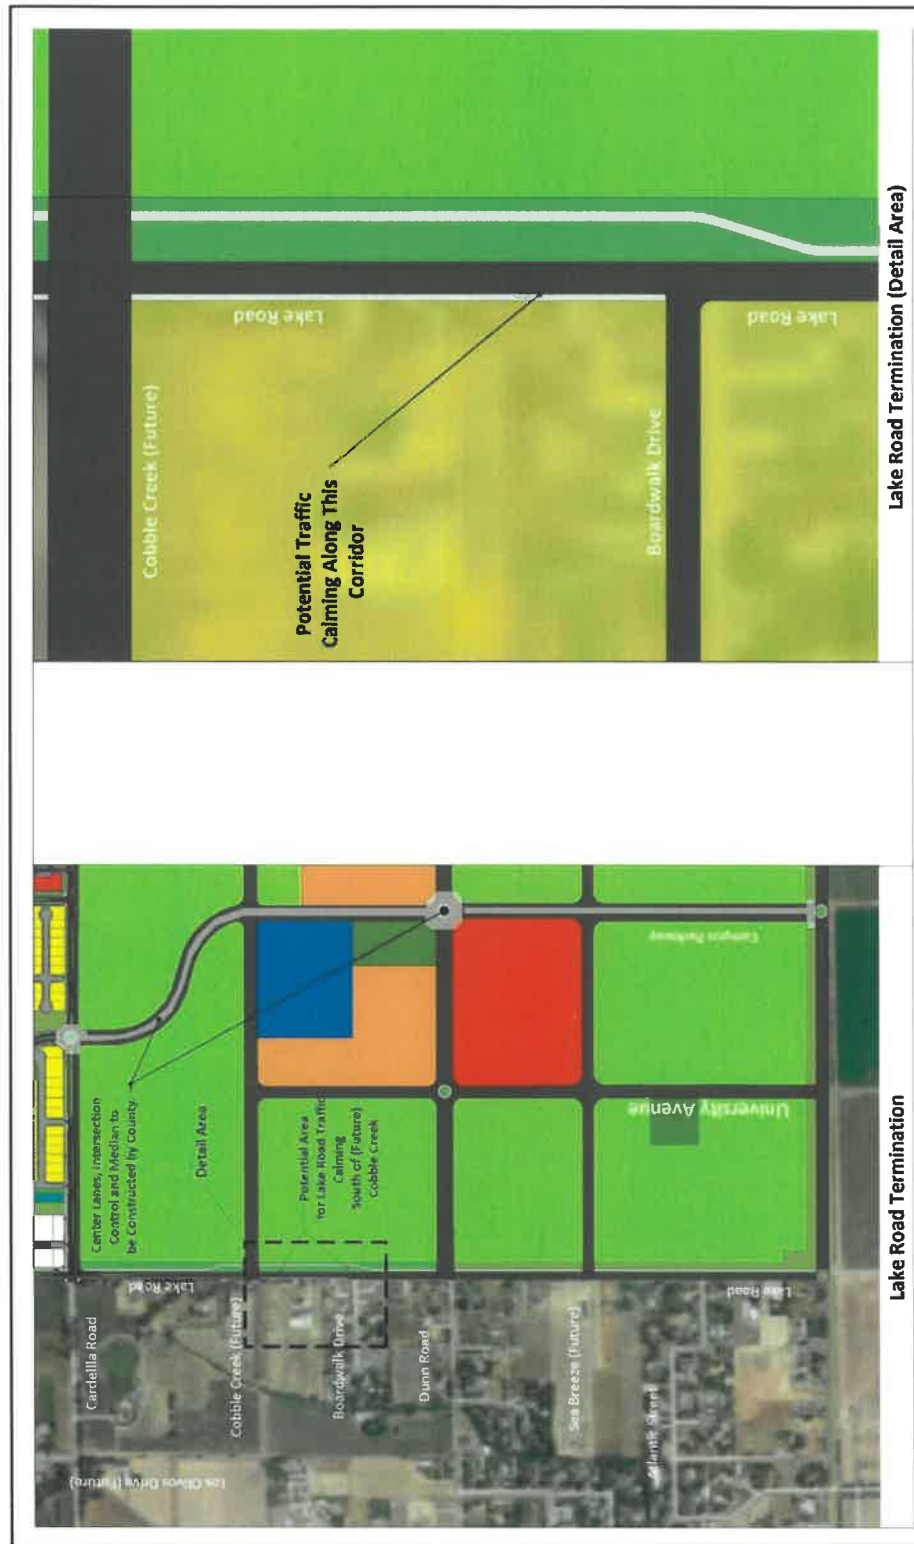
Campus Parkway Lake Road South of Meyers Gate Detail
